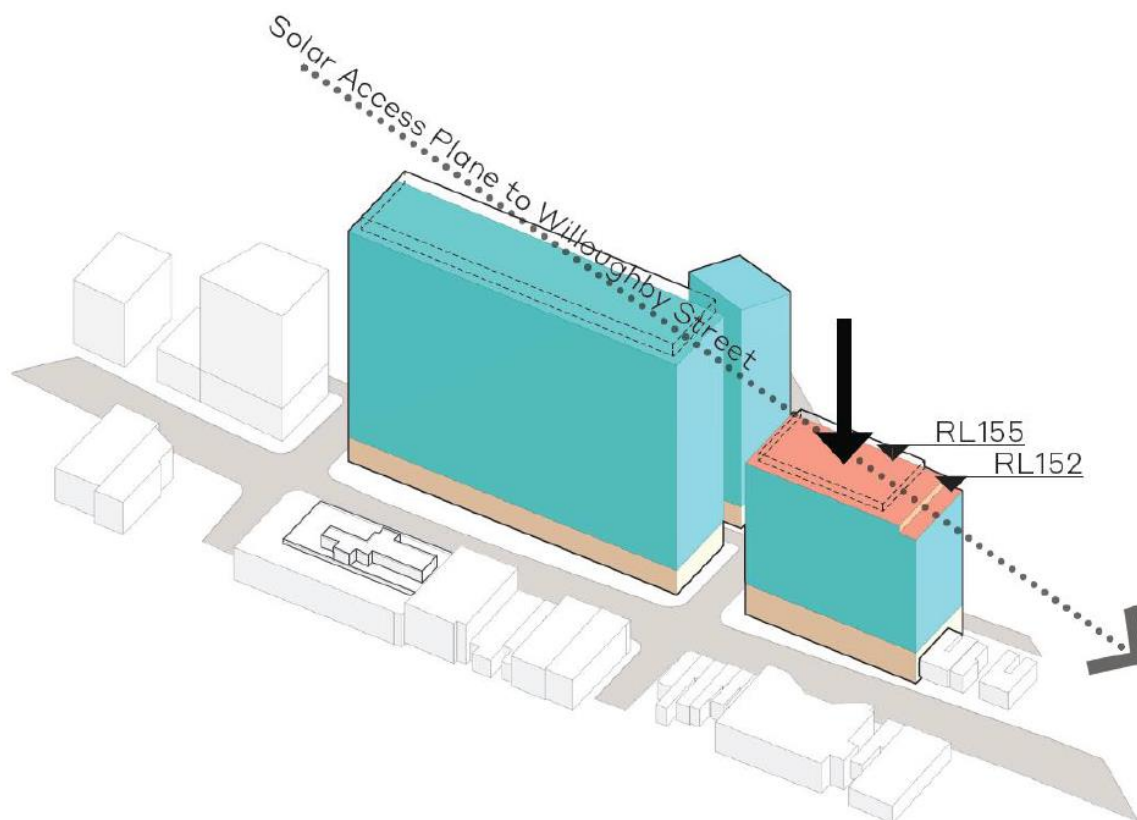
Sun access plane to Willoughby Road affecting the southern upper level setback to Site B under the Exhibited Scheme
